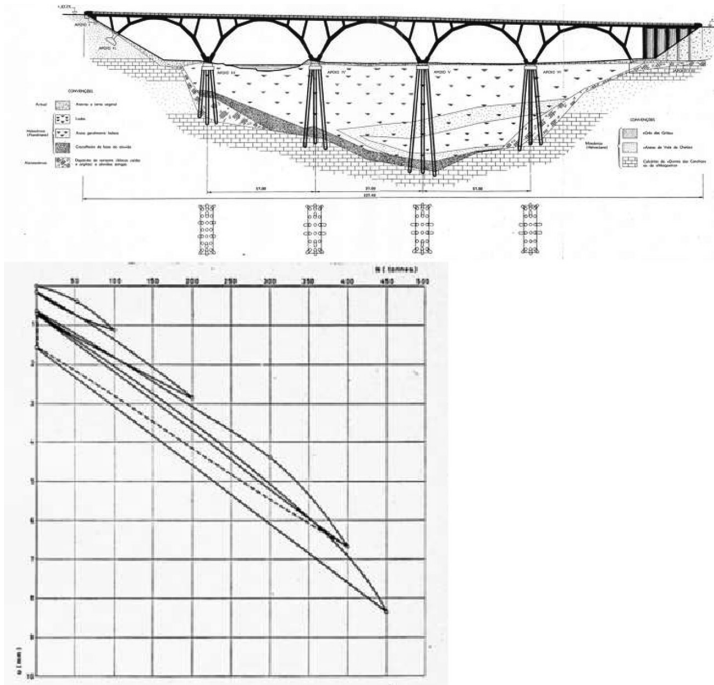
Geotechnical profile and pile vertical load test results [17] LNEC
